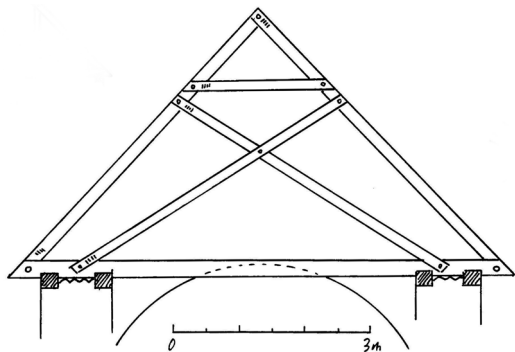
Section of the roofing in Marbäck. A merger of Romanesque and Gothic traits. The tie beam is still in use but instead of strut beams we find scissor beams and the double wall plates, which are usually connected with rafter feet. Each part is numbered. Drawing by R. Gullbrandsson.
